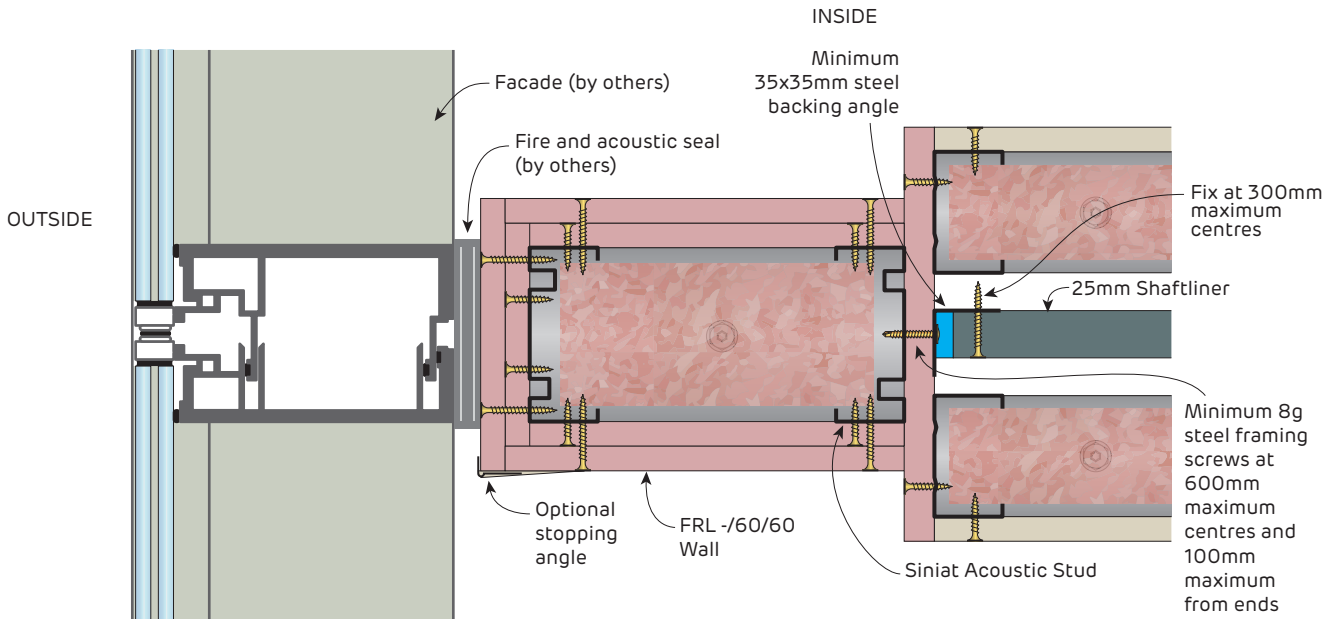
InterHome High-Rise Wall Transition to Curtain Wall Mullion
